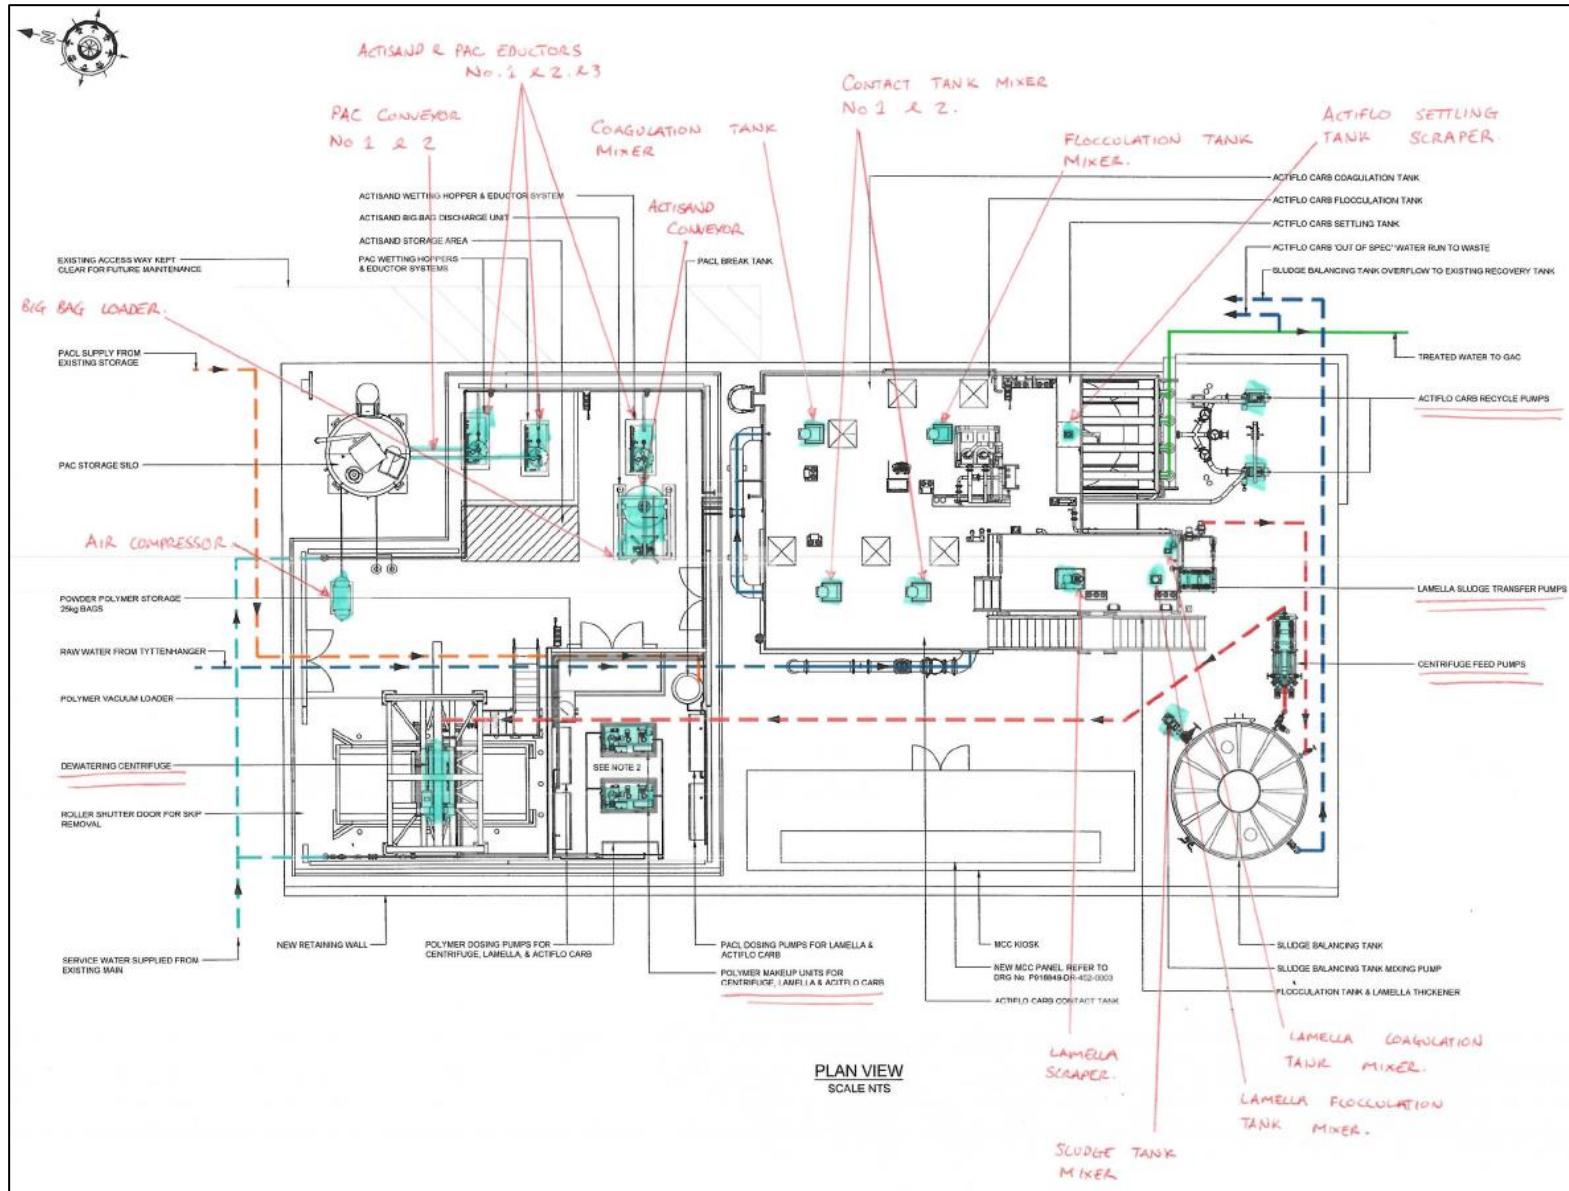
NORTH MYMMS METALDEHYDE REMOVAL PLANT – PROPOSED SITE LAYOUT
